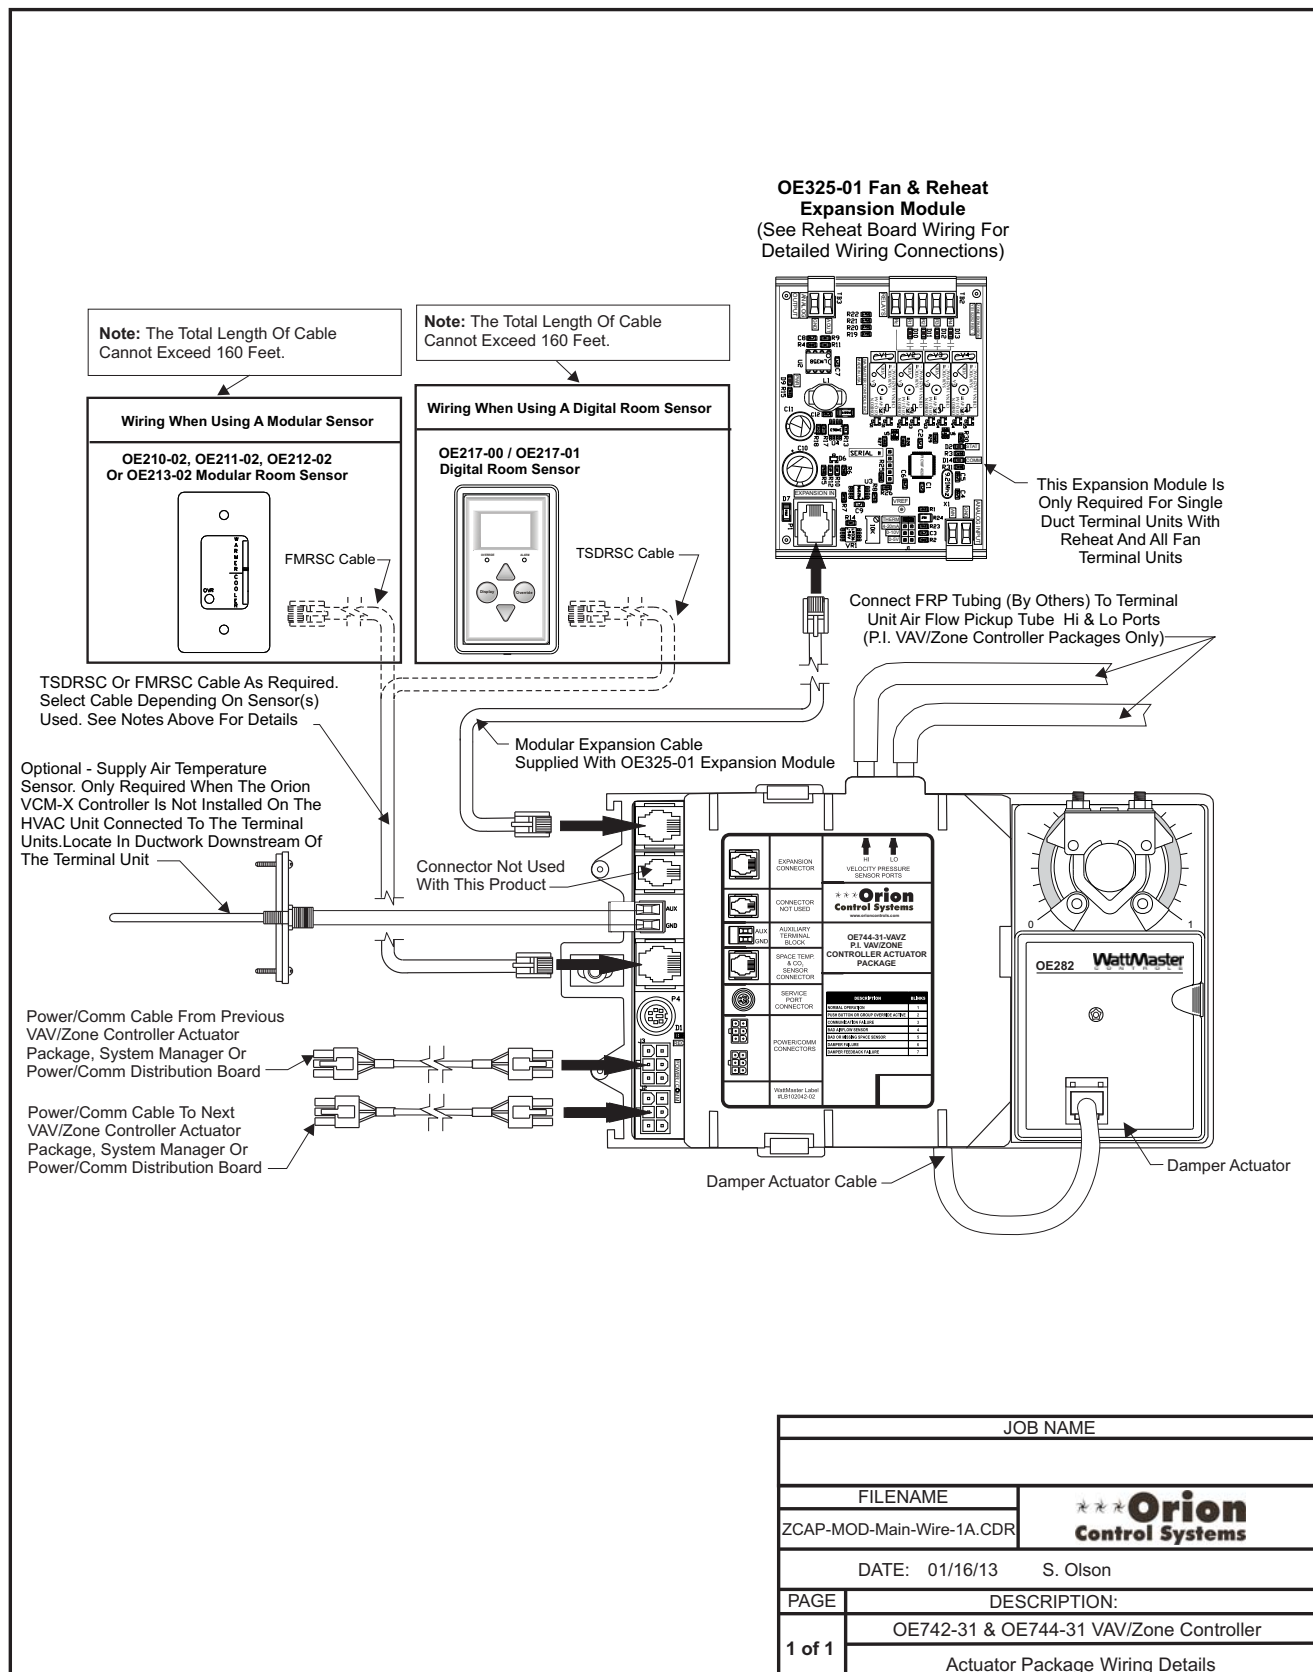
OE742-31 & OE744-31 - Modular Zone Controller Actuator Package - P.I. & P.D. Wiring
